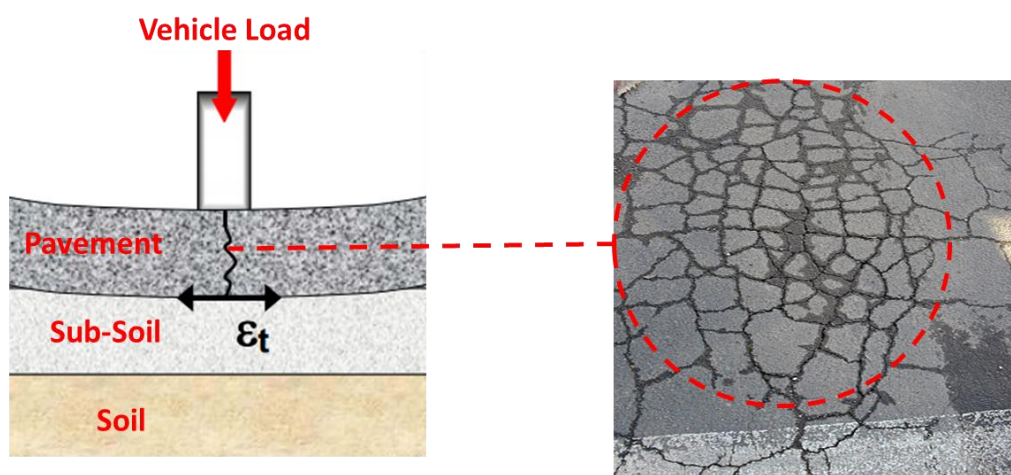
Example of fatigue cracking in flexible pavements.
